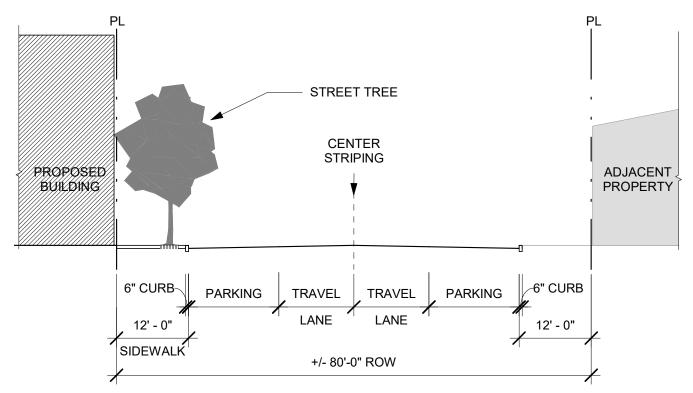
EXHIBIT E - STREETSCAPE OVERVIEW - COMPLETED PLAN
